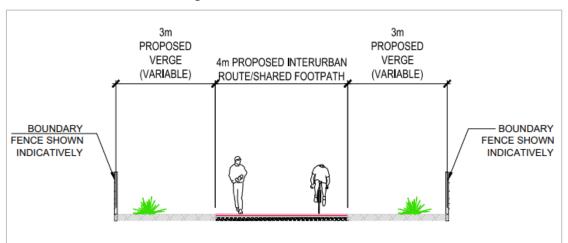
Typical Cross Section of Phase 2 Cycle Route
